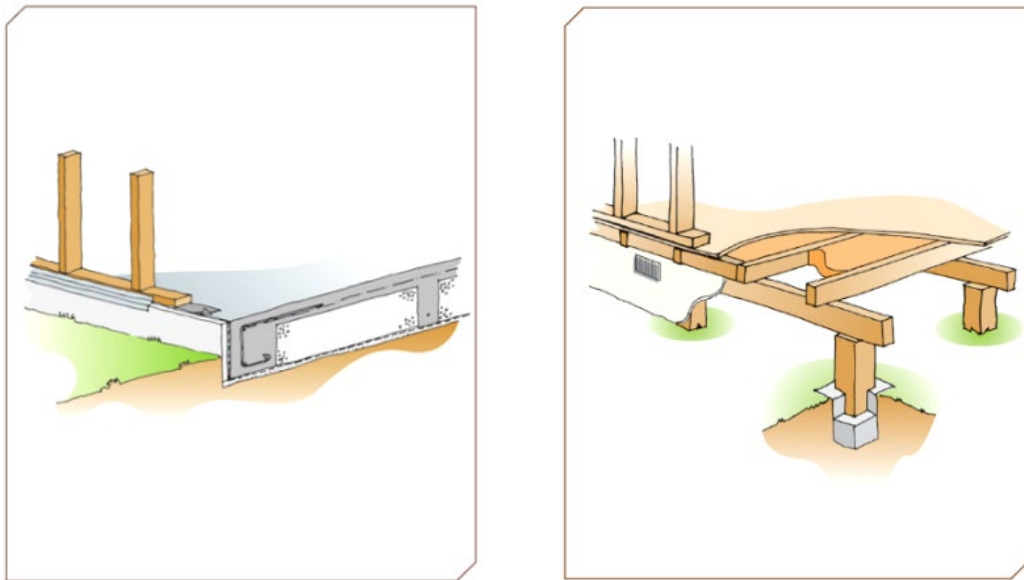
Ground floor assemblies using a concrete floor slab or suspended timber floor
